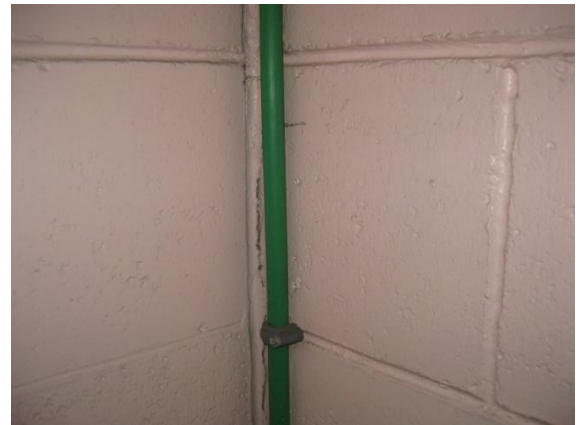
Typical cracking at the junction between internal and external masonry walls
